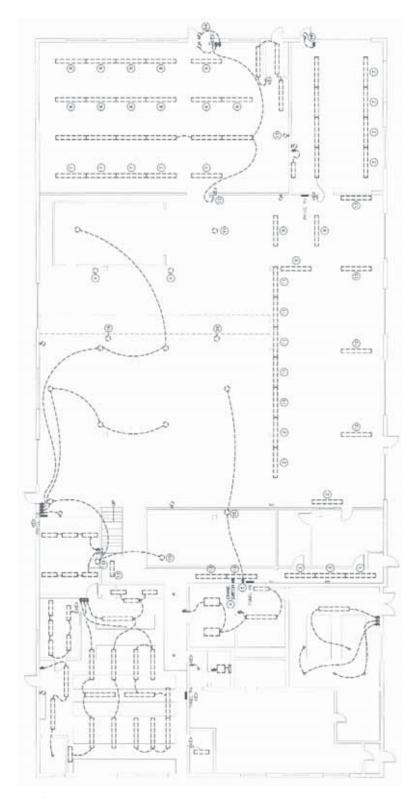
Building Floor Plan from Electrical Demolition Plans dated March, 2006, Sheet E-1, provided by VTrans (N.T.S.).
